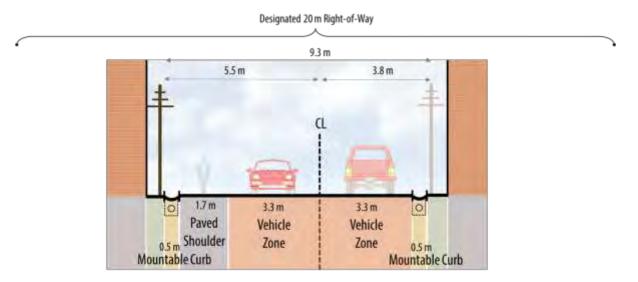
9.3 m Platform Semi-Rural Cross-Section with Paved Shoulder for Belfountain Village (Community Centre to north/west of Caledon Mountain Drive)
